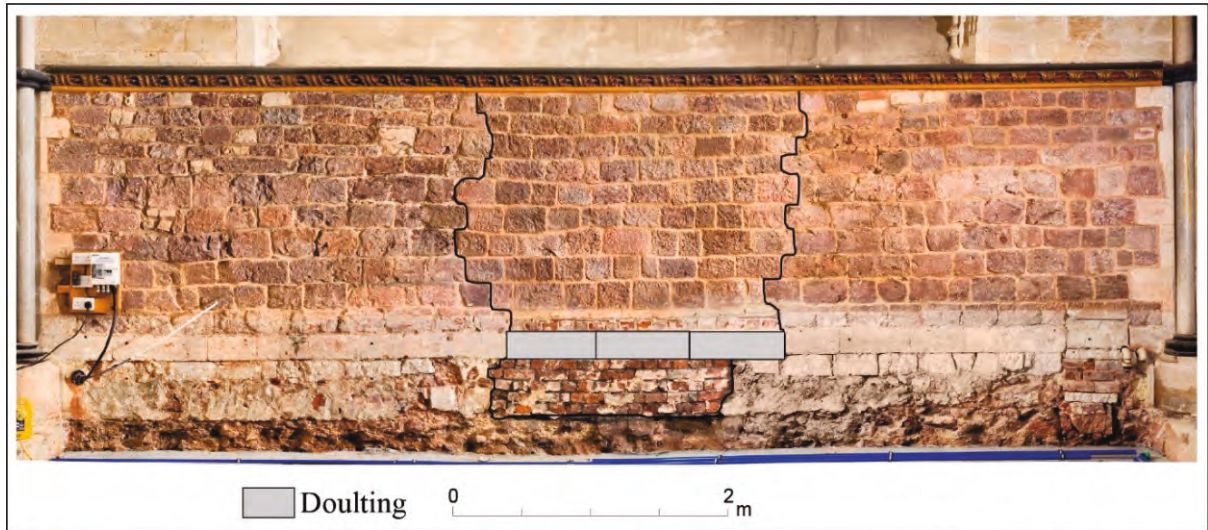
The Chapter House, internal face of the east wall: photographic record prior to replacement of render, showing the scar of Kendall's fireplace of 1820, infilled in 1937-40 (*photo: Gary Young*).
